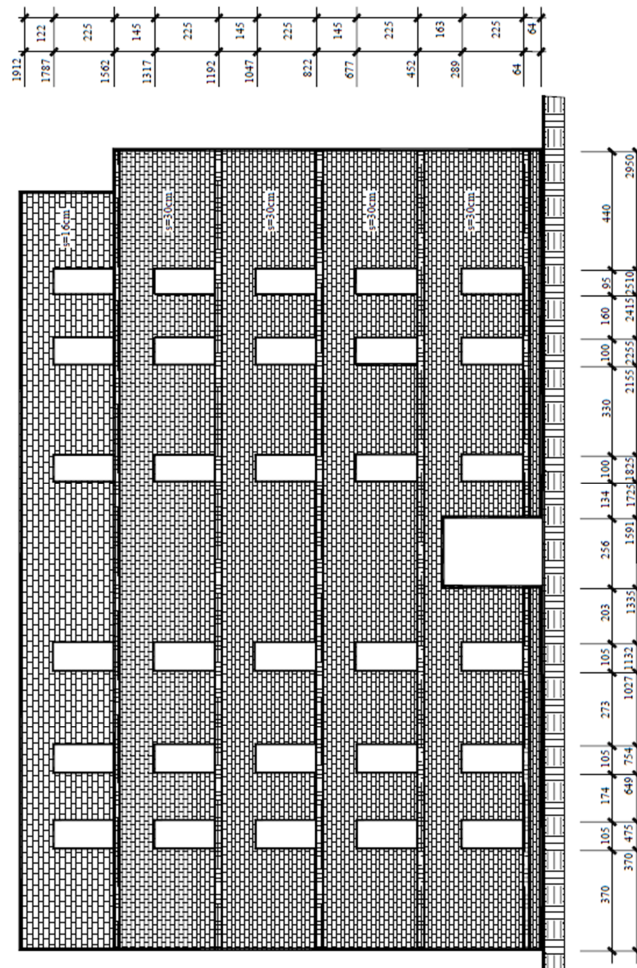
Geometric diagram of the inner wall of a five-story building [6]
